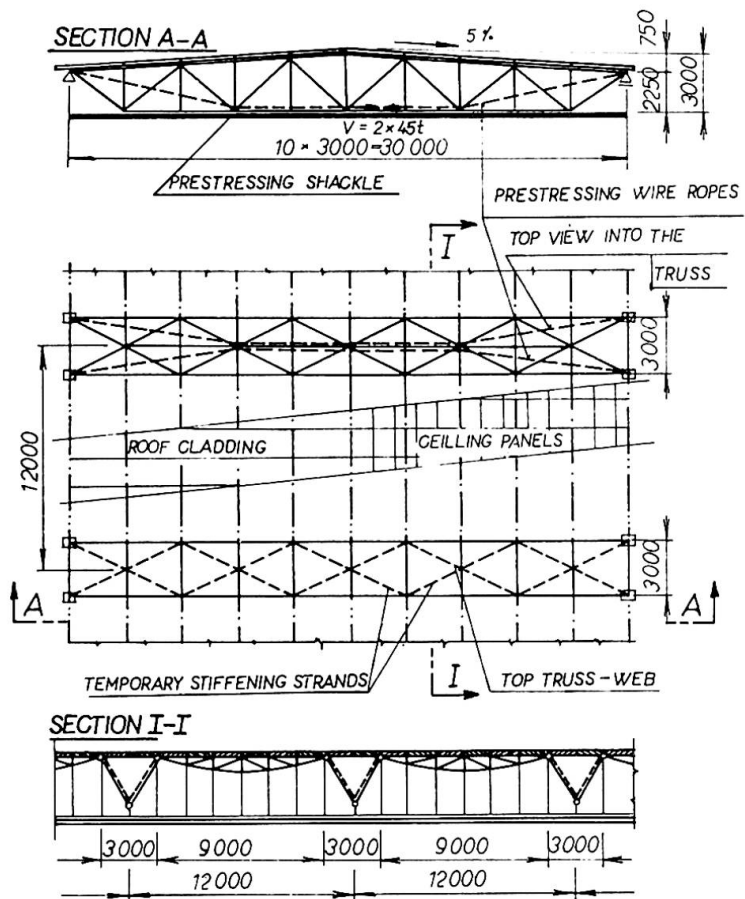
Tubular roof truss prestressed by two polygonal tendons
